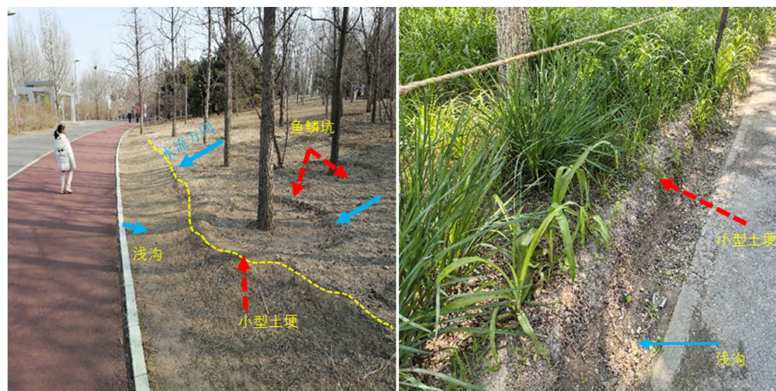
Typical green space micro-topography combination: fish scale pit, earth ridge, shallow ditch layout
